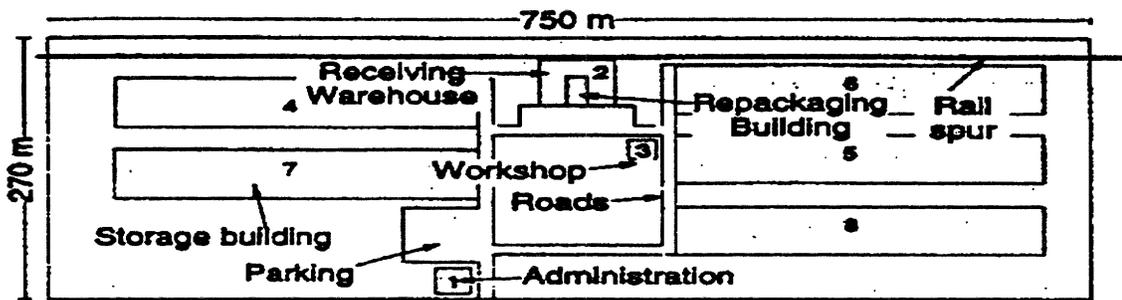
Site Layout UO₂ Building Storage - 100% Capacity
